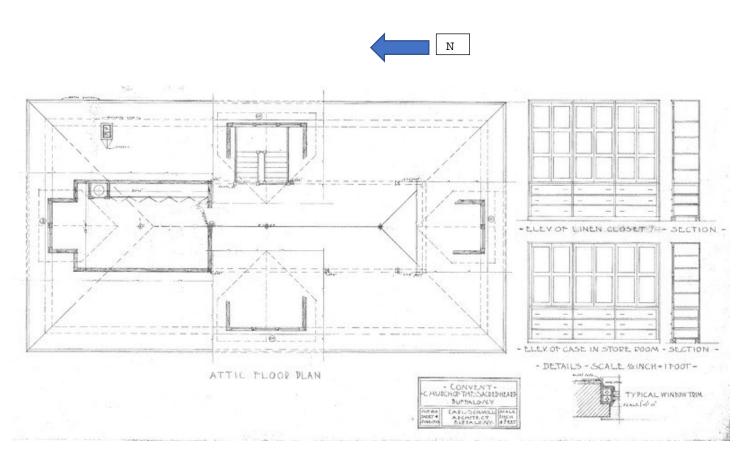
Attic Floor Plan, Convent, Church of the Sacred Heart (1913)
